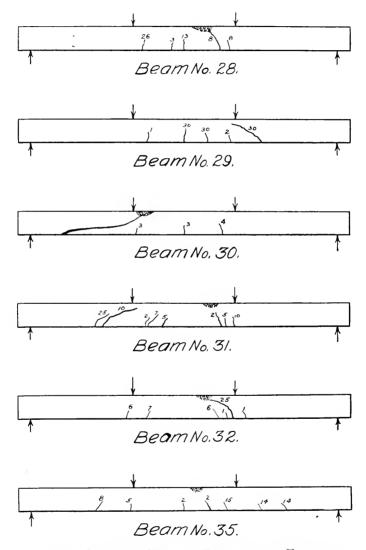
Sketches Showing Beams after Failure Under Repetitive Loading.
